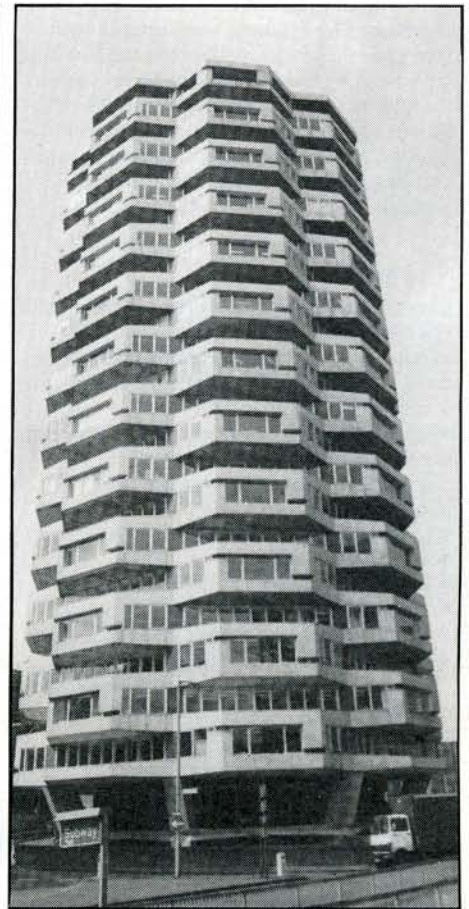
NLA Tower at Croydon, which uses lightweight concrete floor slabs. Designed by Ove Arup and Partners
